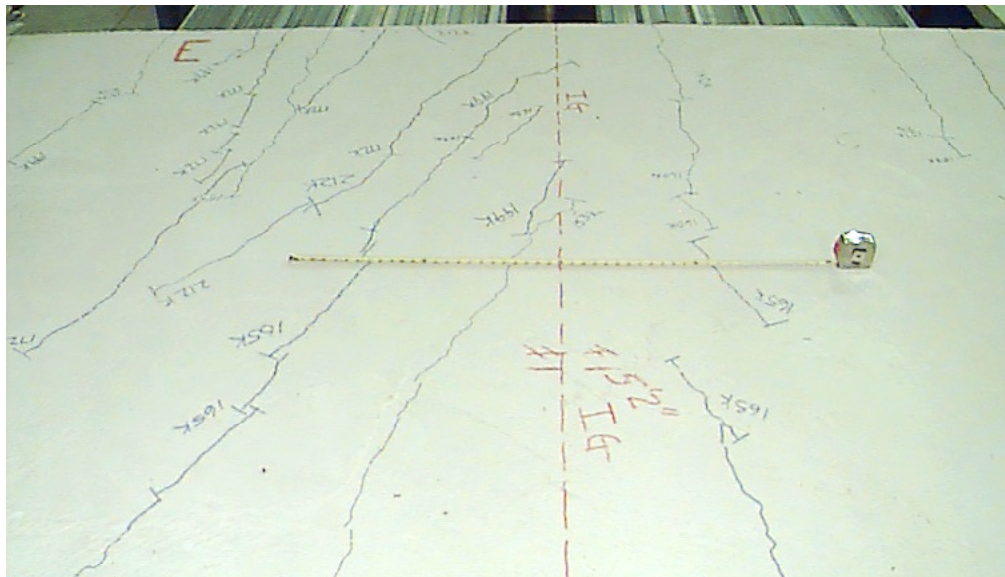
East End Slab Cracking Over EG/IG (FF-2)
